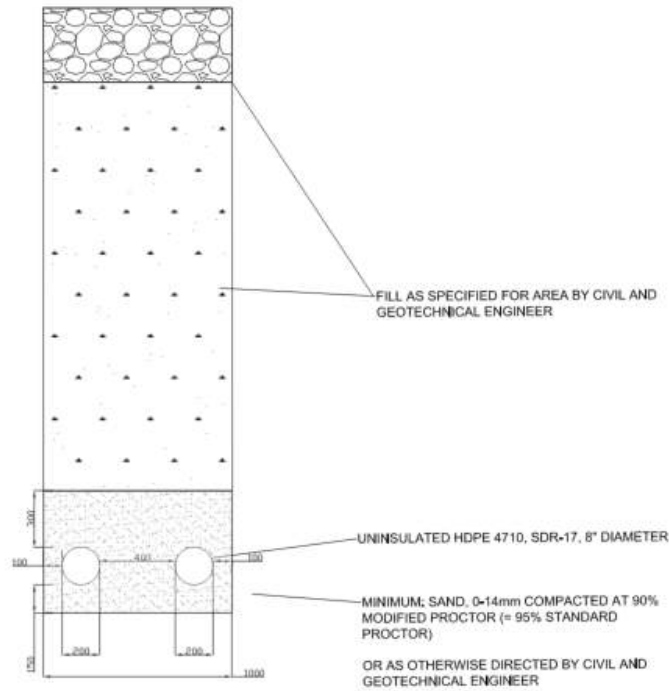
Typical Trench Profile - Uninsulated HDPE Piping
